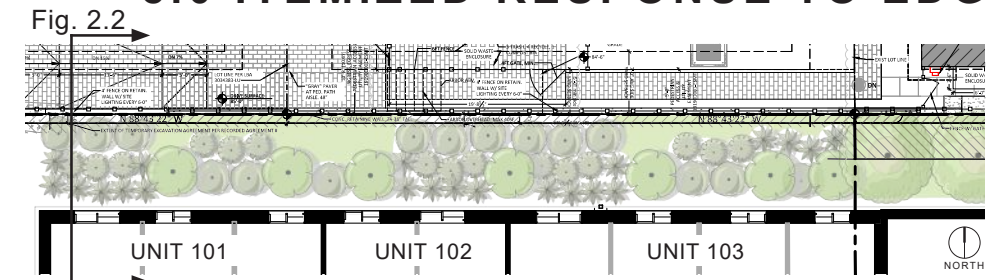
Landscape plan at north property line, showing planting and existing fence which will improve security for residential units.
